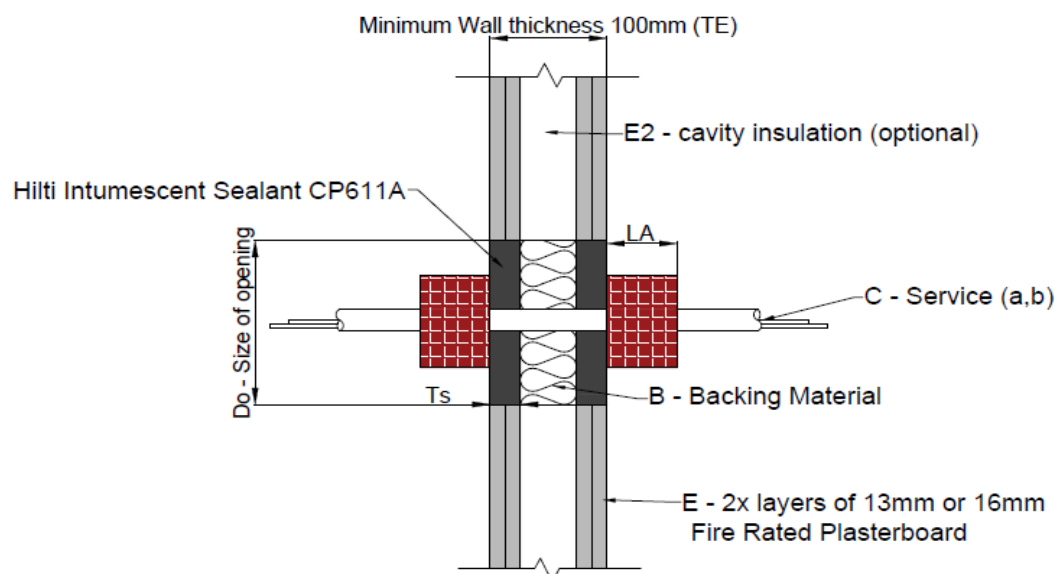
Steel Conduits $\leq 16\text{mm}$, with additional protection, refer to table 10
